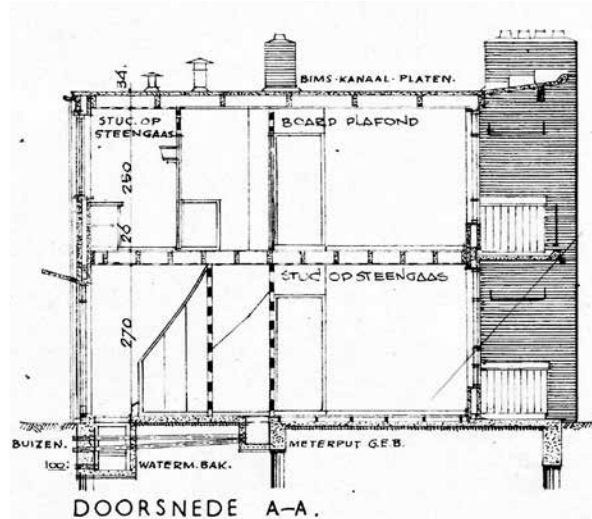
Typical cross-section for the Frankendaal public housing, as submitted for plans approval. Note the first-floor floor construction: *stuc op steengaas* (plaster work on wire mesh) (SAA: SU10075686_00001).
